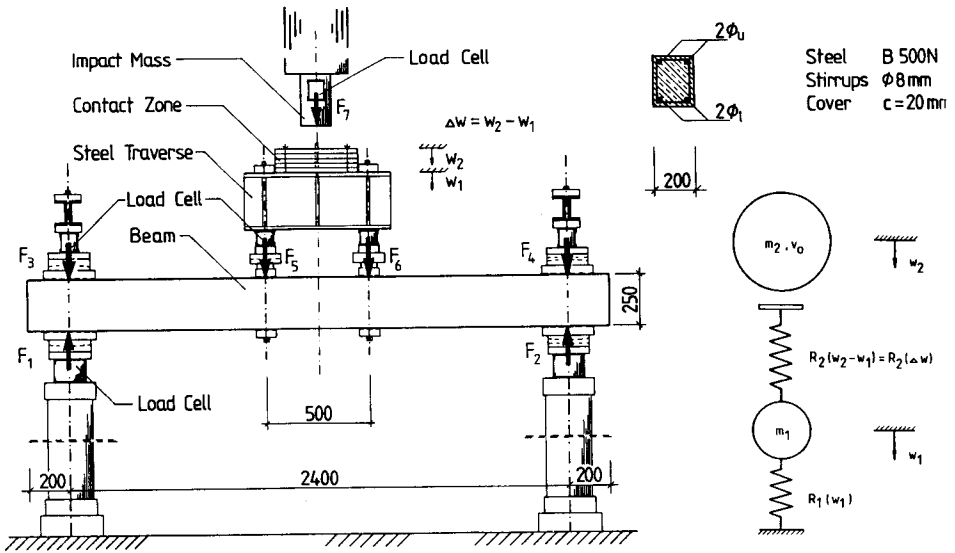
a) Beam test set-up for impact testing and typical reinforcement arrangement for static and impact loading; b) TDOF substitute system
